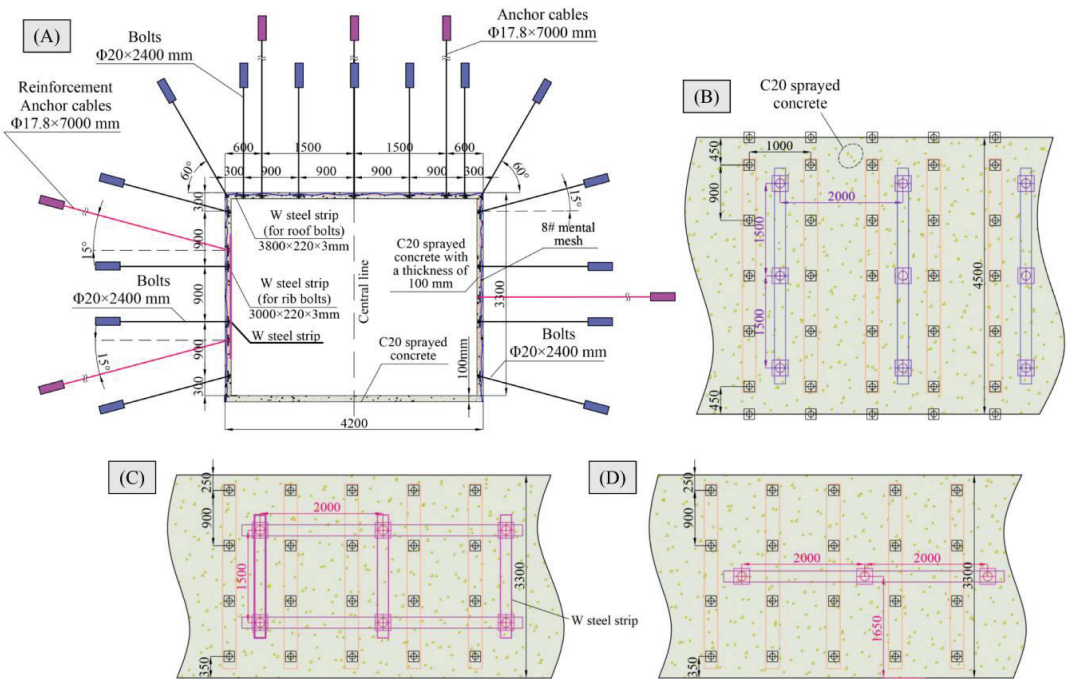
No. 3 coal seam main return-air roadway reinforcement support program. (A) Entry section. (B) Support pattern in roof. (C) Support pater in coal pillar rib. (D) Support pattern in virgin coal rib.
